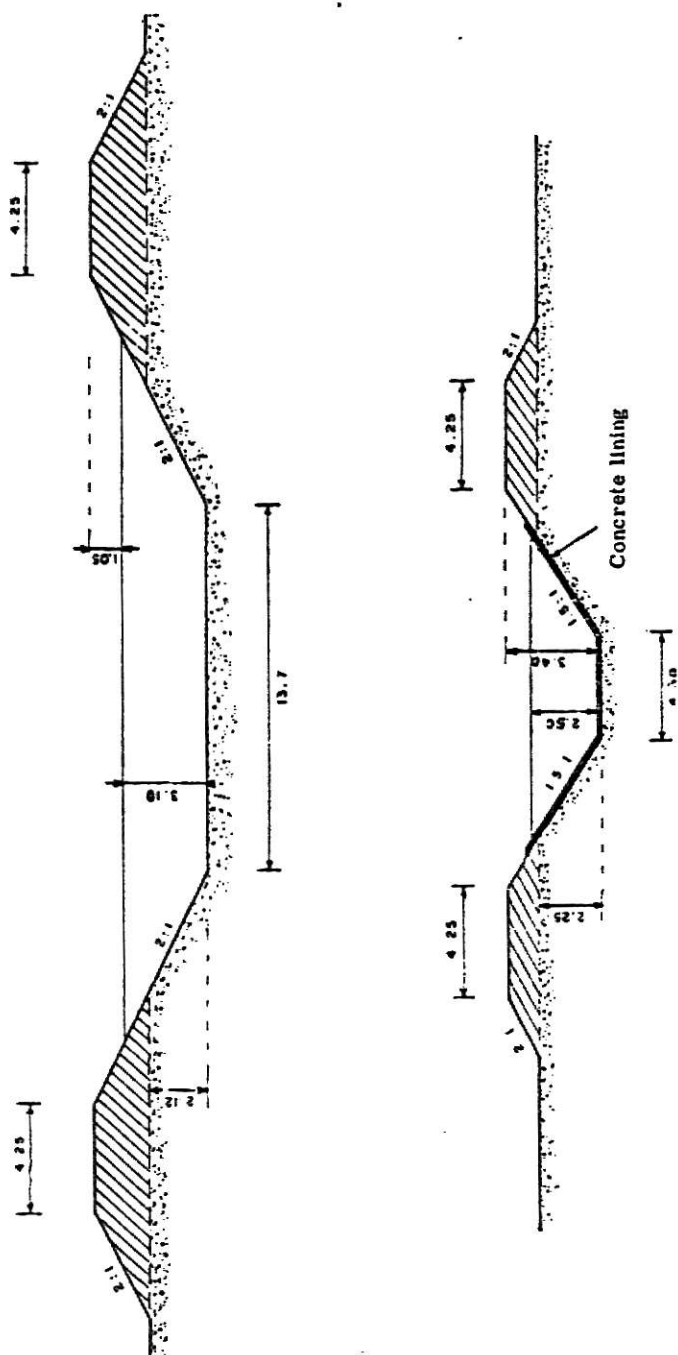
Comparative cross sections of an unlined and a concrete-lined canal (5)
